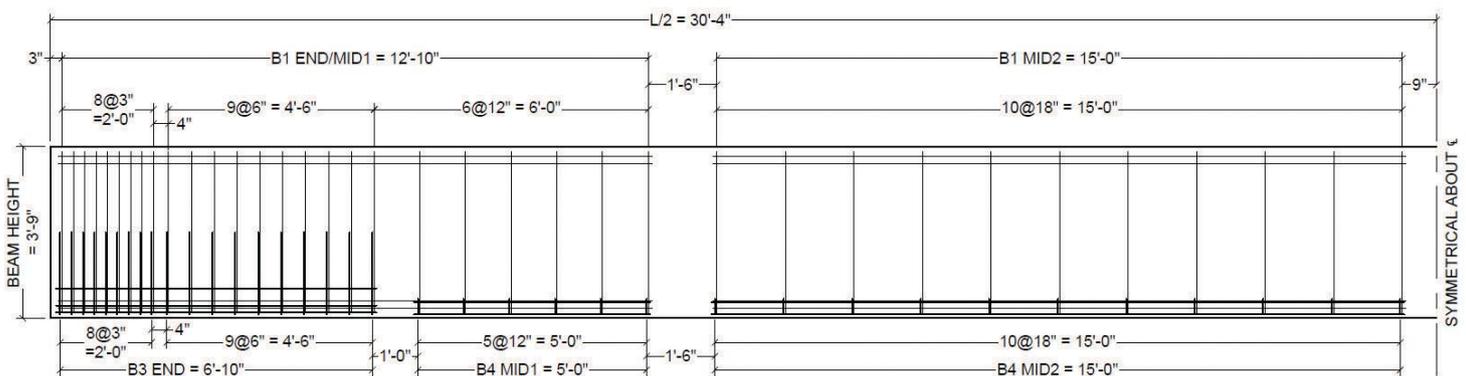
Beam elevation view in a typical WWR submittal showing the required placement of specified welded wire reinforcement mats.
